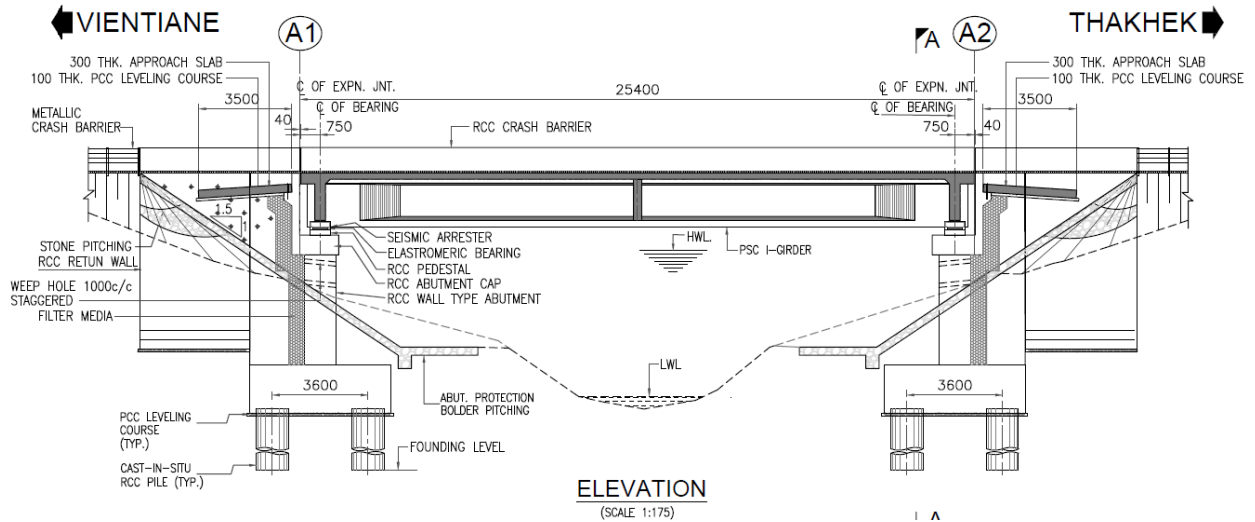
Bridge Spans of Houay Xambounnyai Bridge
